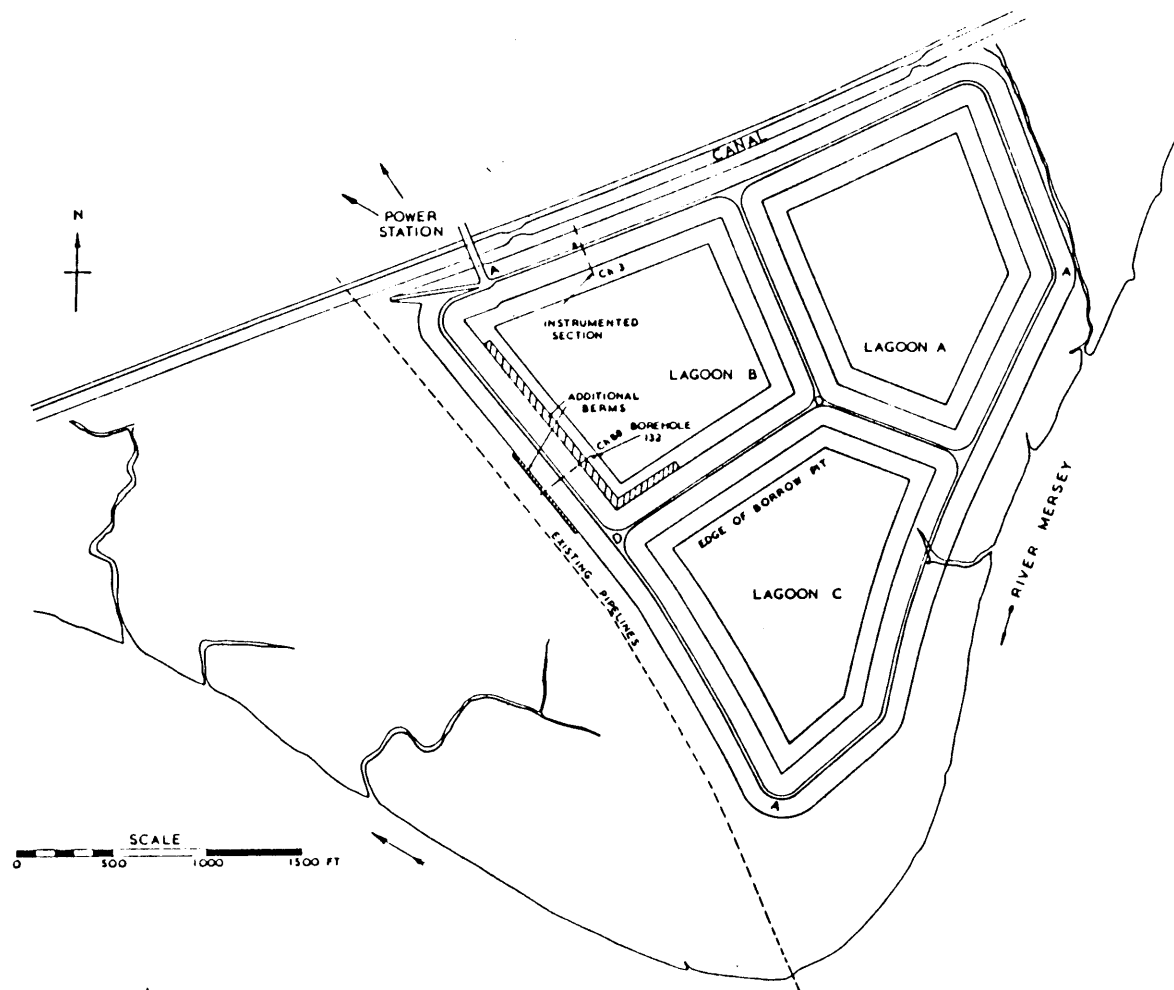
Plan view of Fiddler's Ferry power station lagoons and embankment
